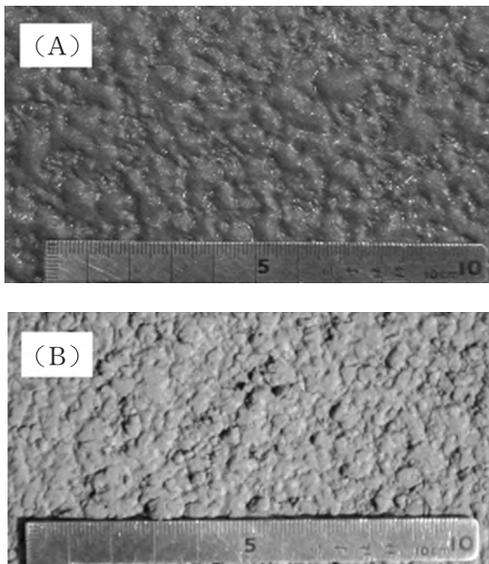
Surfaces. (A); New surface, (B); Surface used for five years.
